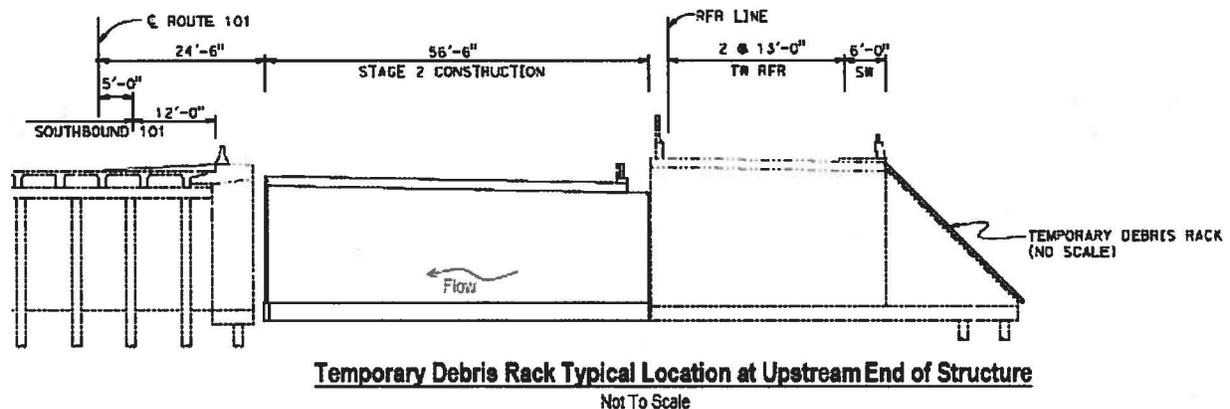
Elevation View with a Typical, Suggested Location for the Temporary Debris Rack.
